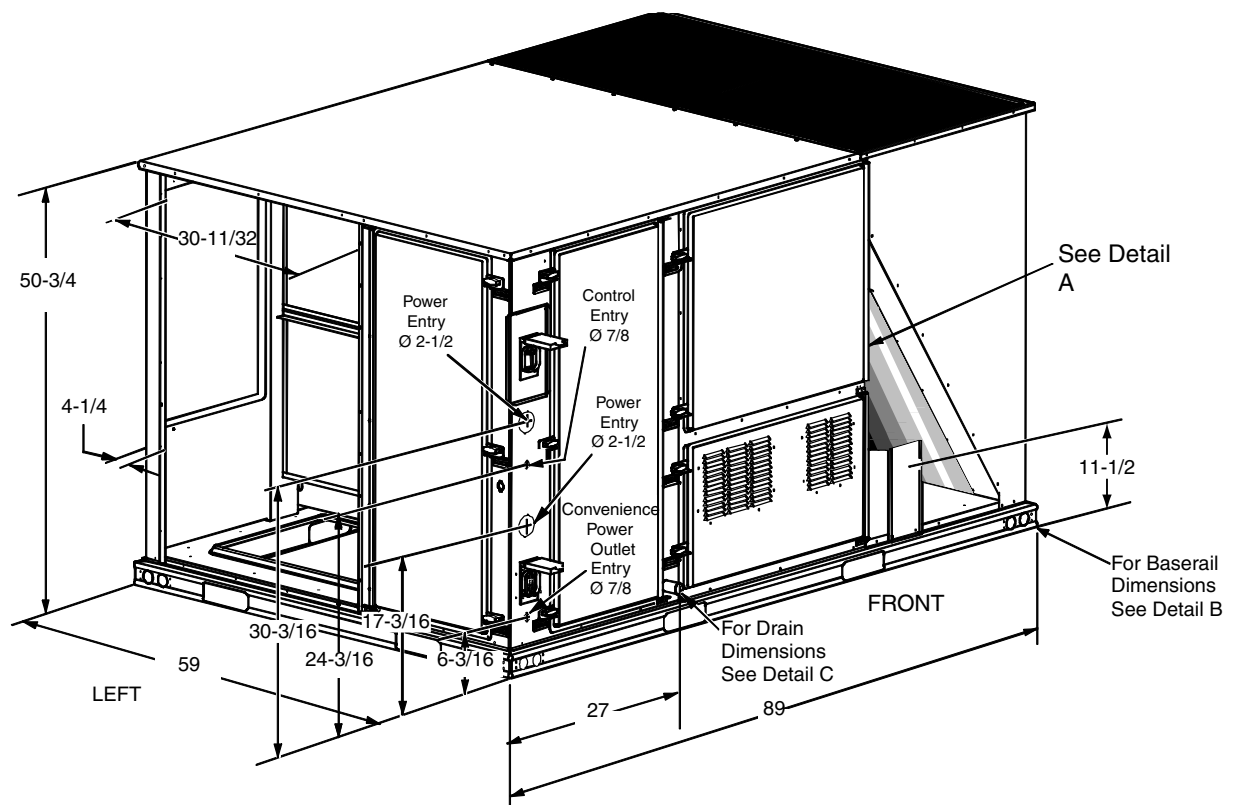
DR090/120 UNIT DIMENSIONS
